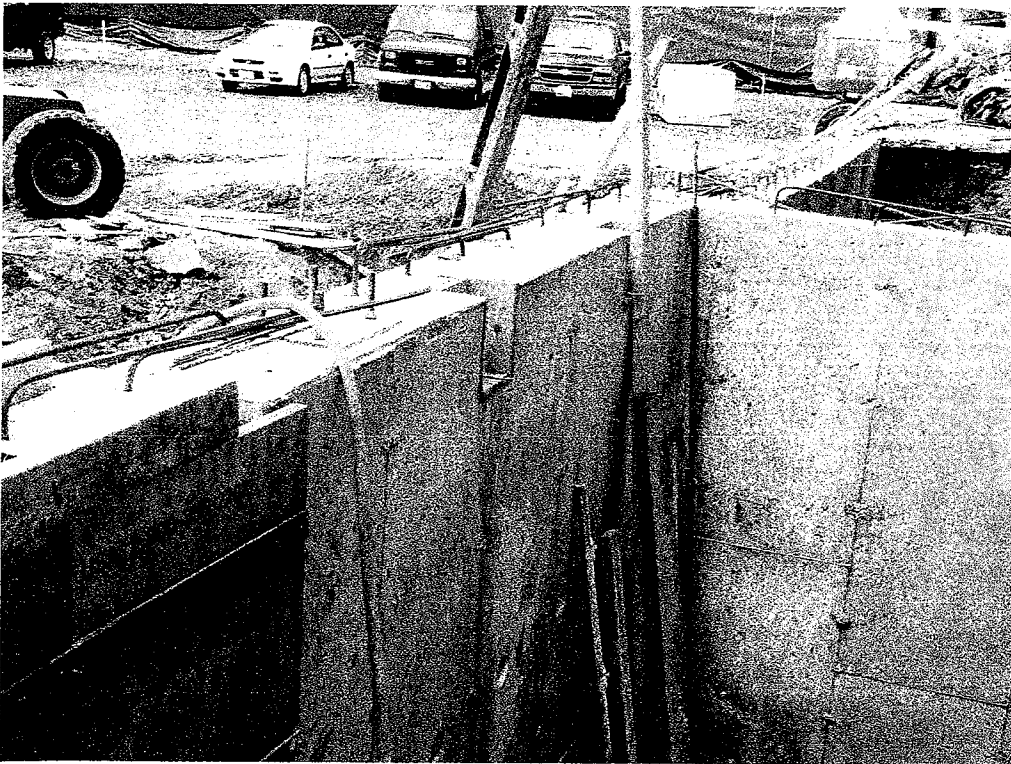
Back entrance foundation wall. Note beam pocket and dowels at top of foundation wall.
